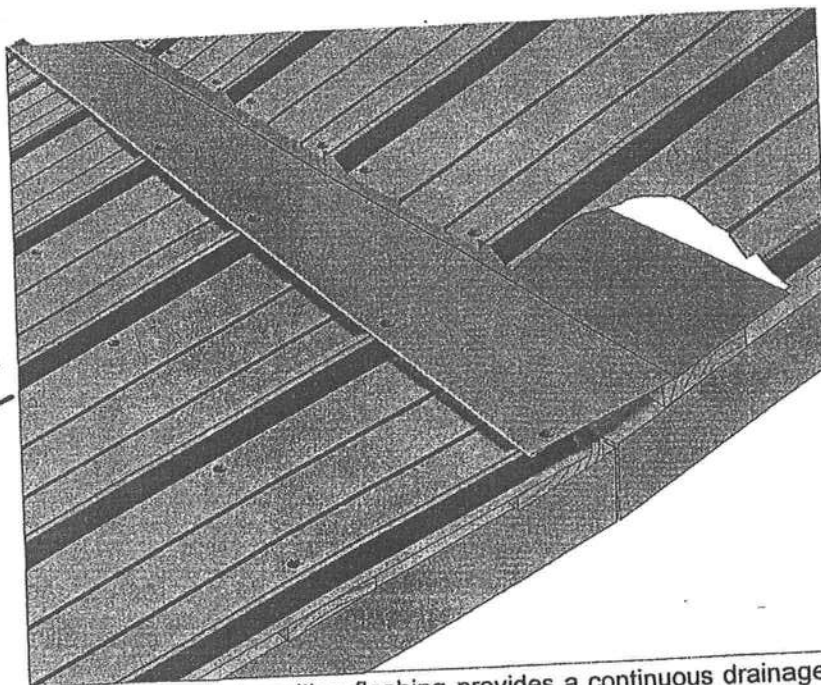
The transition flashing provides a continuous drainage where two slopes meet.
